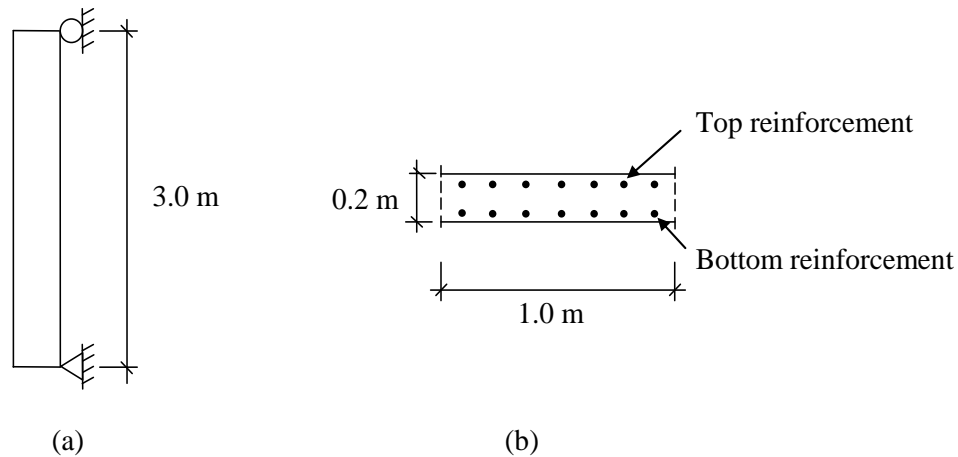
(a) Impact loaded wall with boundary conditions; (b) Cross-section.
